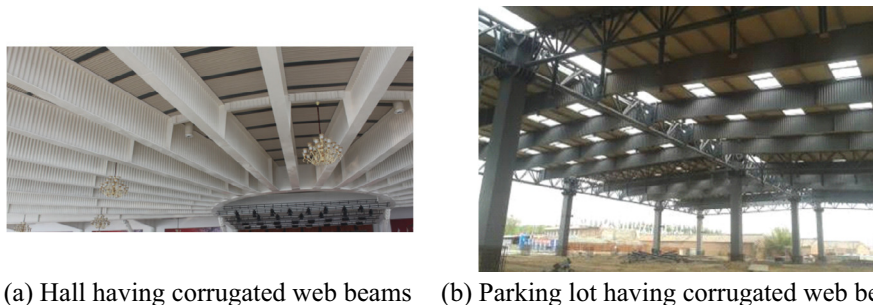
Applications of beams with sinusoidal corrugated web. (a) Hall having corrugated web beams and (b) parking lot having corrugated web beams.
